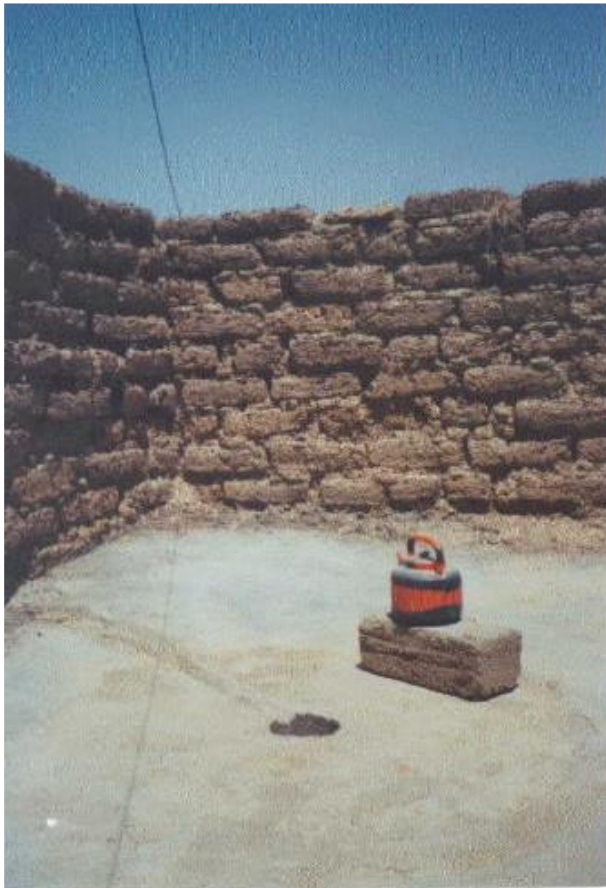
Improvement of a simple pit latrine by slab in Reinforced Concrete
